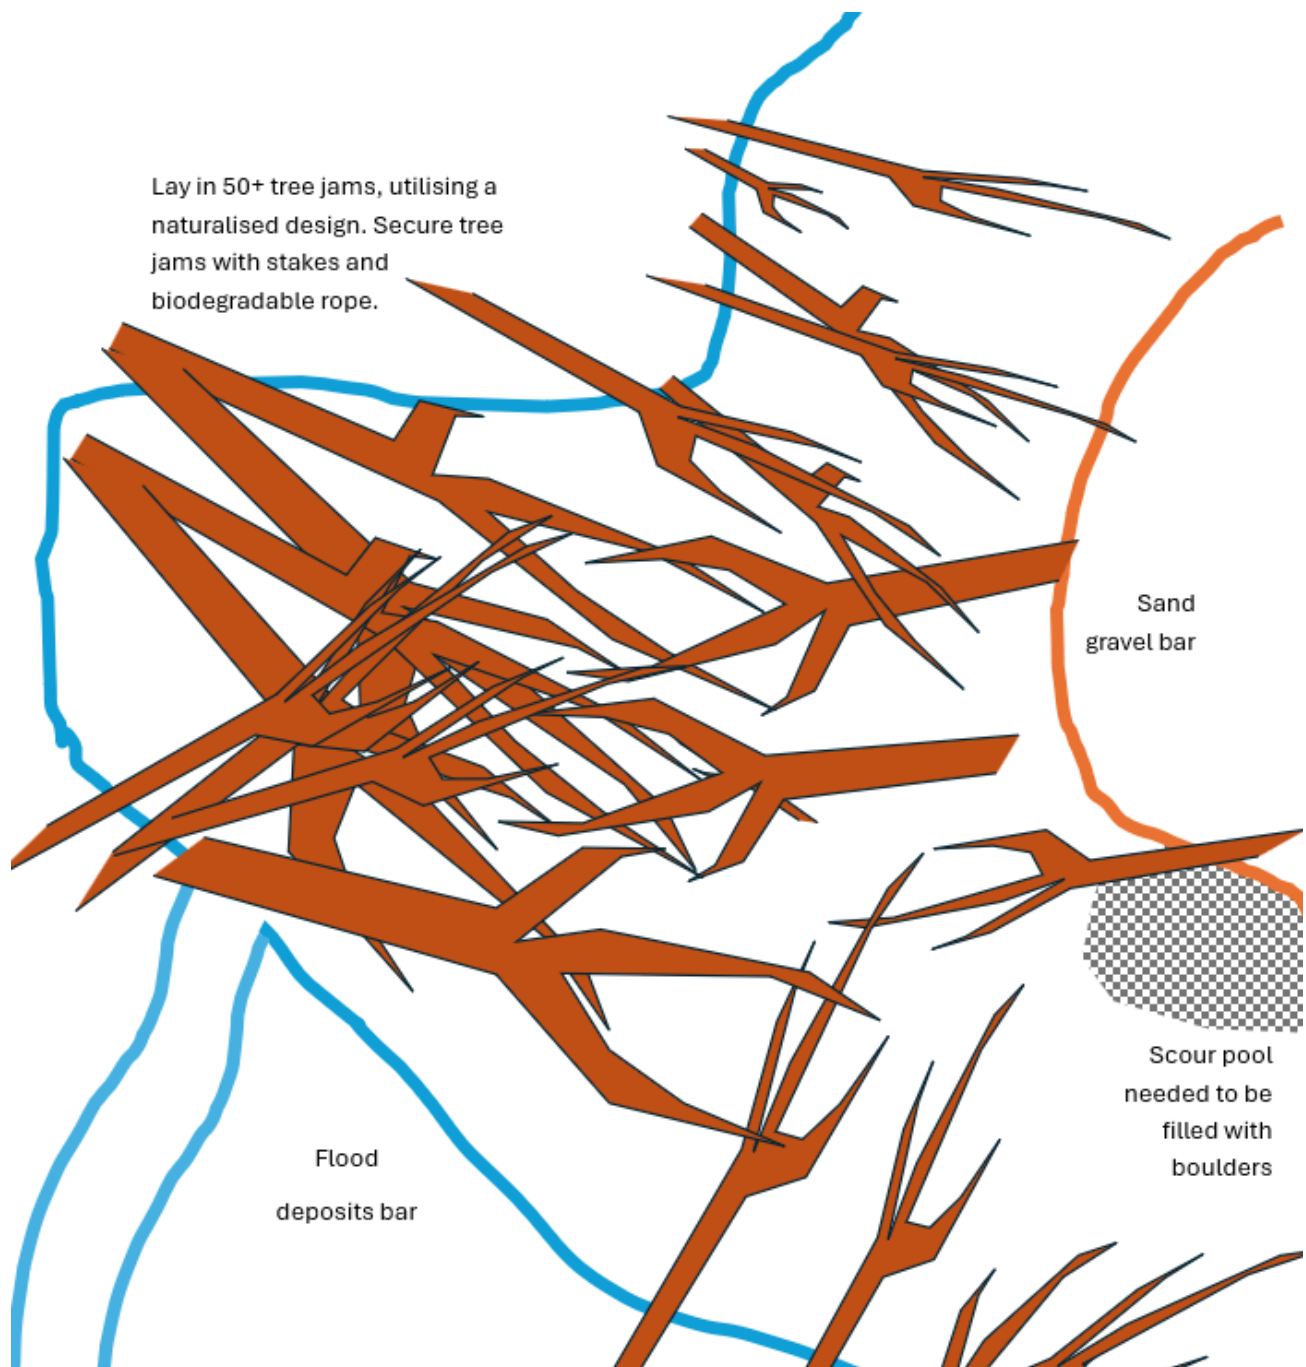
Detailed design drawing outlining tree jam complexes for Site 21.
